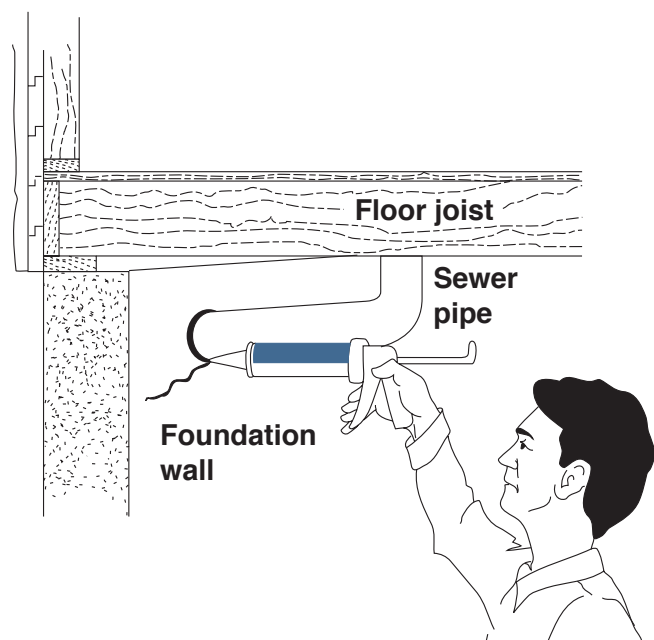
Caulk any gaps around the openings in the basement wall through which services (electrical, plumbing, heating) enter the house.
